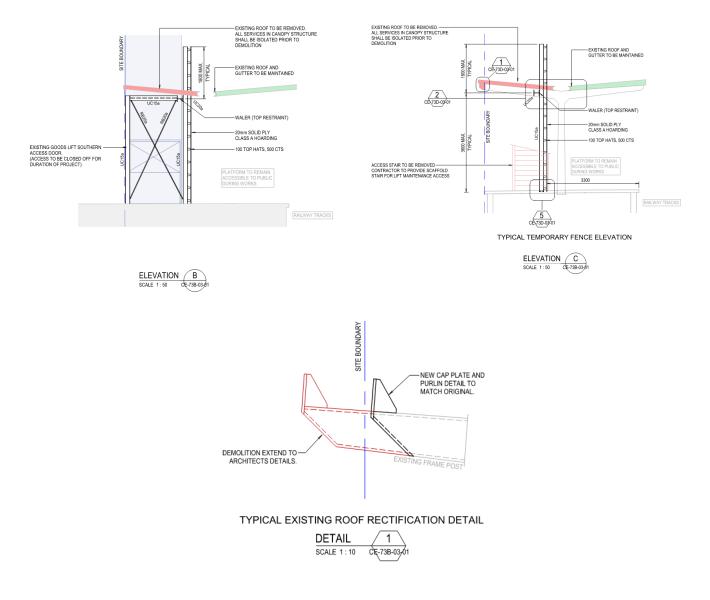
A-Class Hoarding Sections & Details – Platform 1 Central Station
